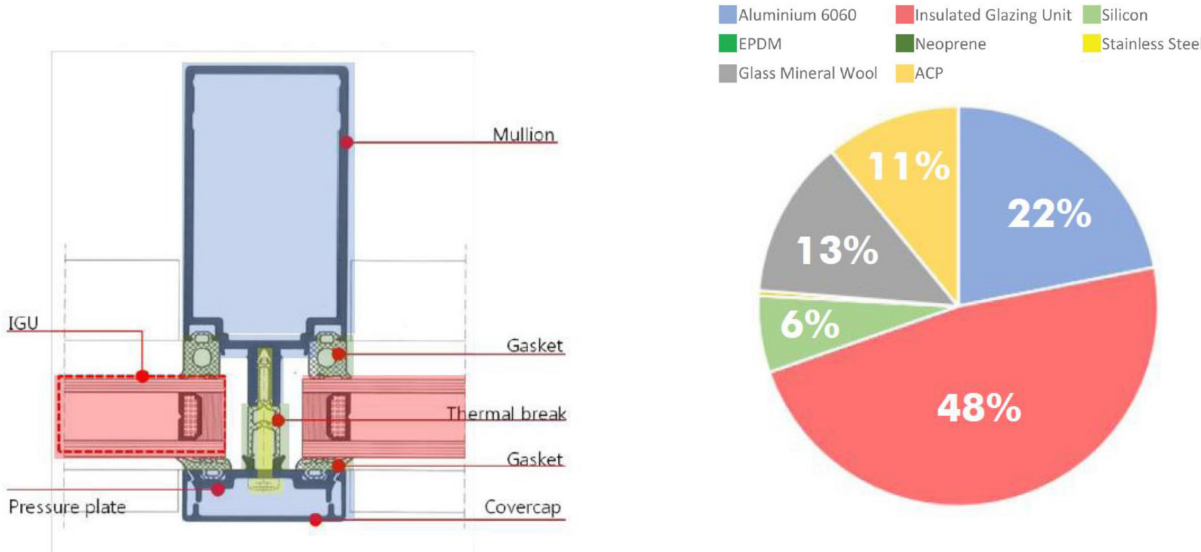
Typical curtain wall profile horizontal section indicating % of consisting materials (Source - Author)
